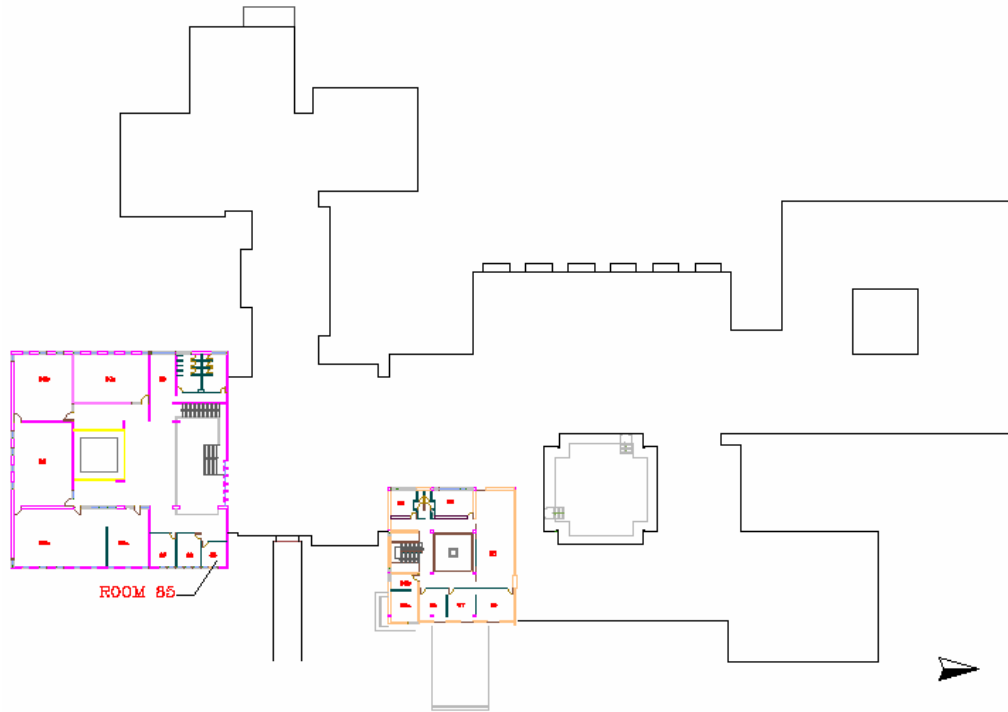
First floor plan of the case-study building. ( the course of building science 566)
